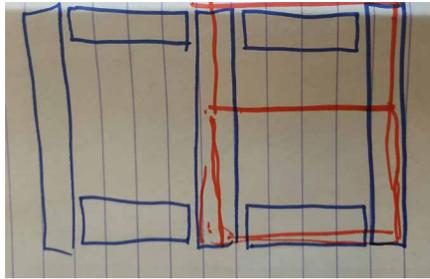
Sketch of timber frame as one larger wall module
